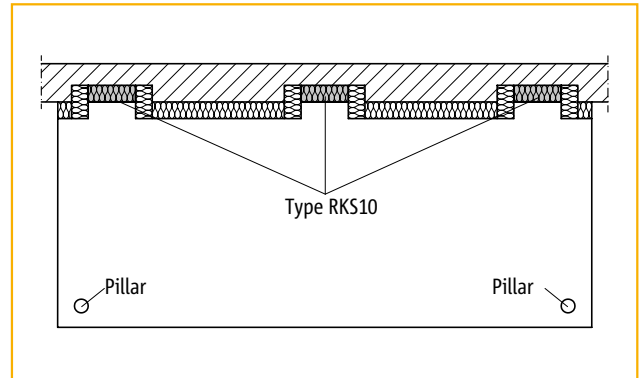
Connection of a balcony to an existing floor using type RKS10, supported construction
